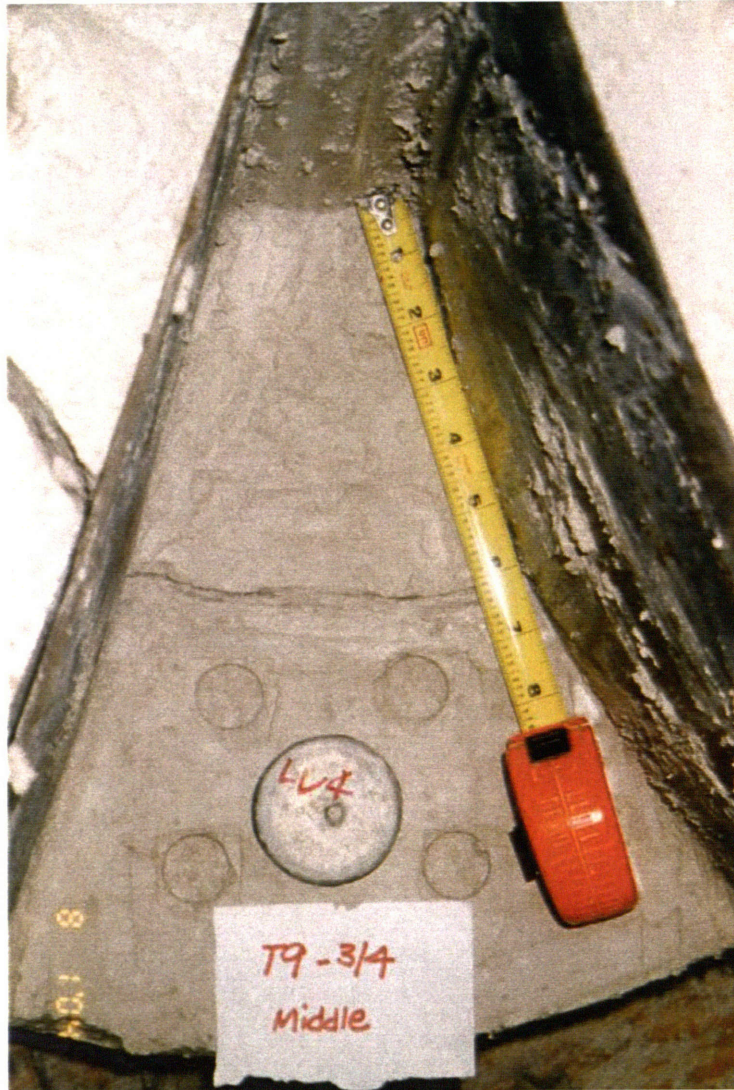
(i). View of exhumed grouted disc in Specimen T9
